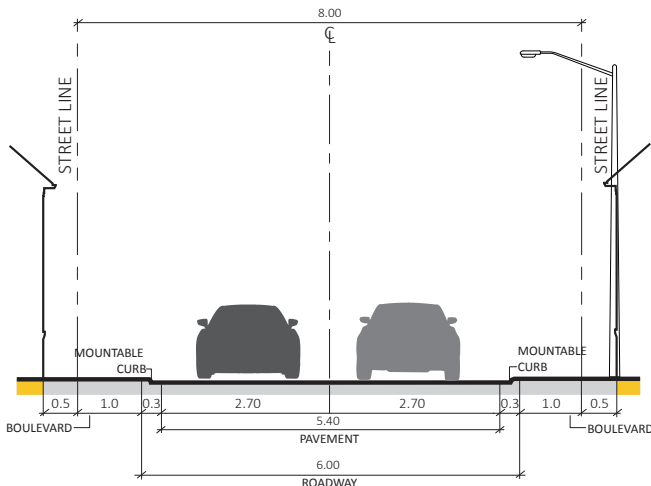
Typical Laneway (8m R.O.W.) Cross-Section
